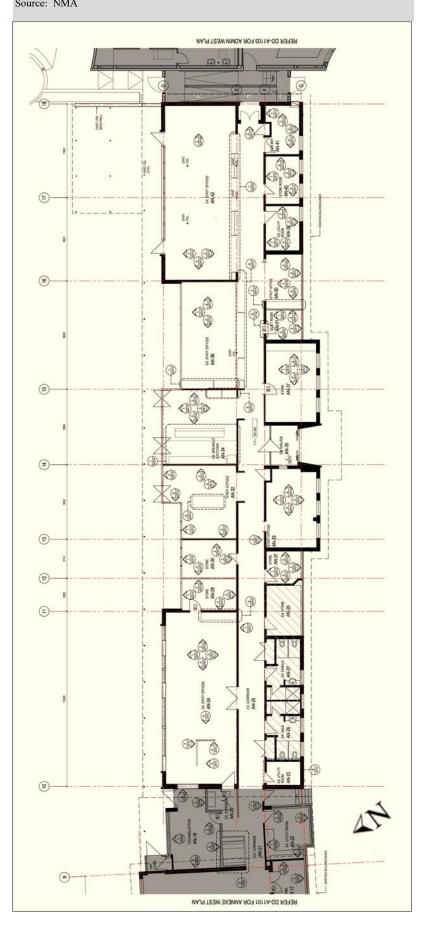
Acton Peninsula Building 2 – former Isolation Ward – Floor Plan Source: NMA
